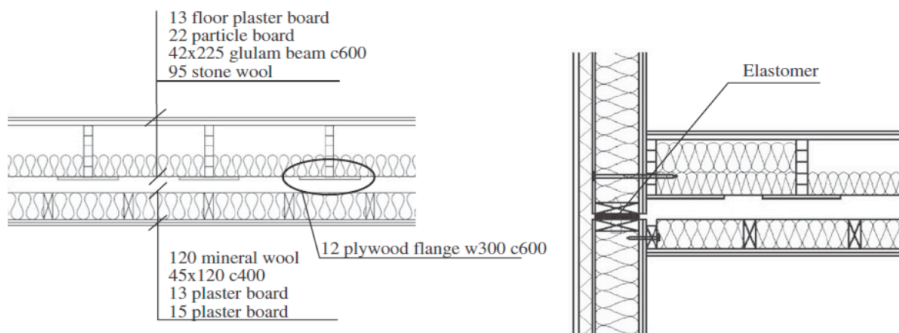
Floor/Ceiling drawings (left) and assemblage with the façade element, the so-called outer-wall (right).
